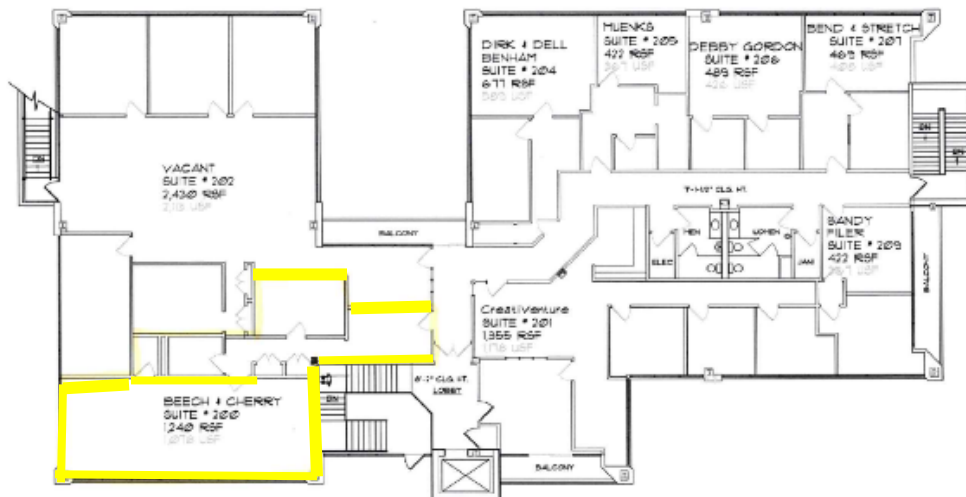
Floor plan with Fitness Labs location highlighted in yellow.
